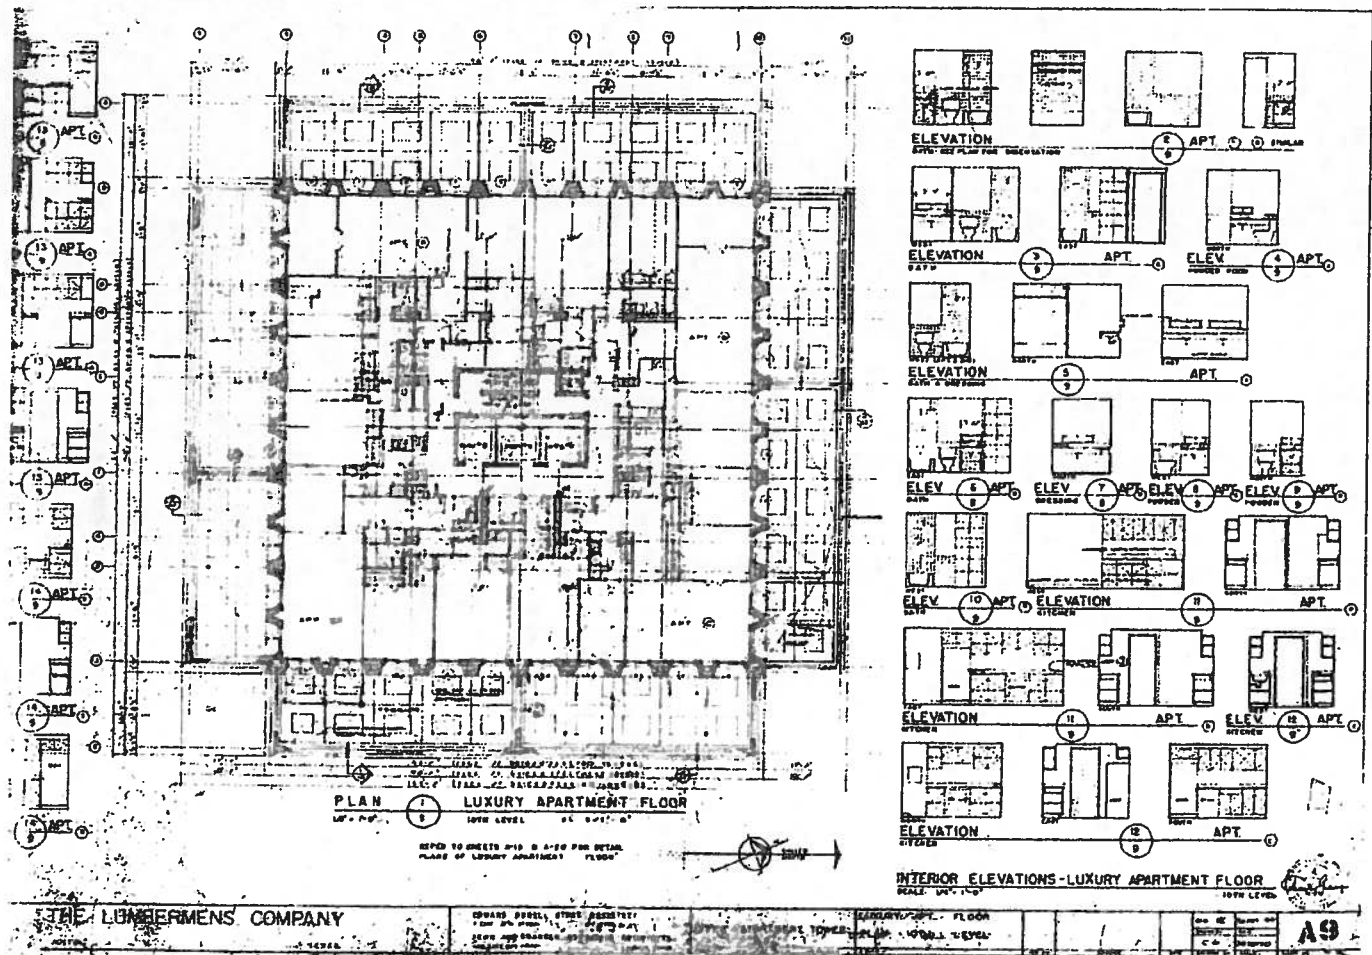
Plan for Level 10, luxury apartment floor with terraces.
